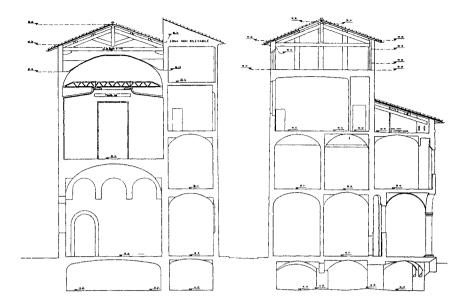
Section A-A of the two main fabrics of the building laying around the court
